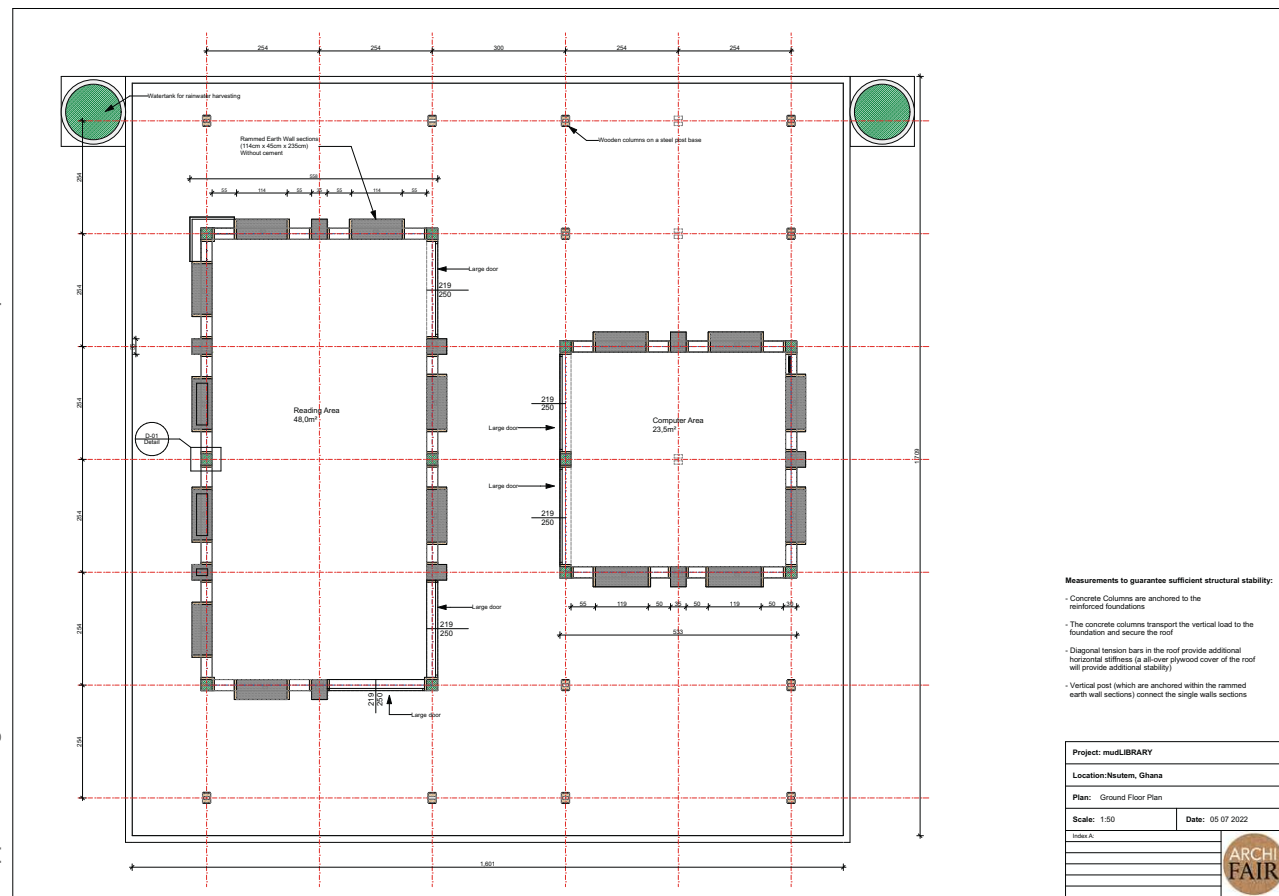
Plan status of the floor plan at departure to Ghana | July 22
